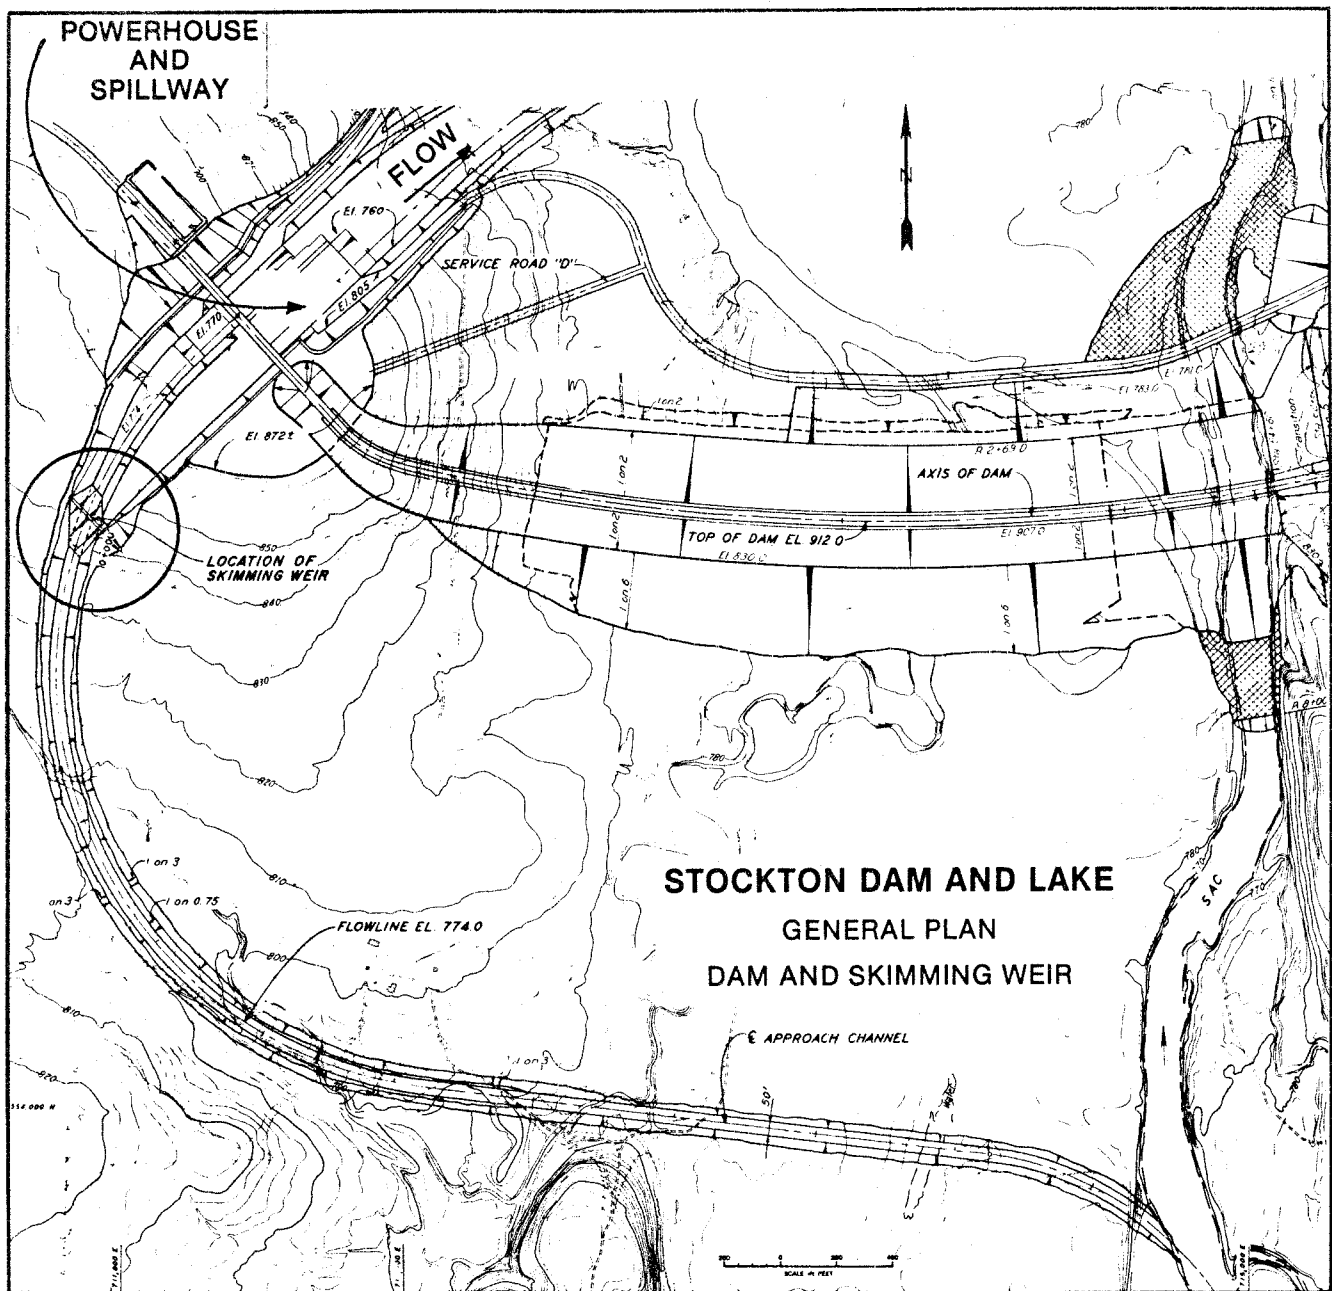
Stockton Lake General Plan Dam and Skimming Weir
